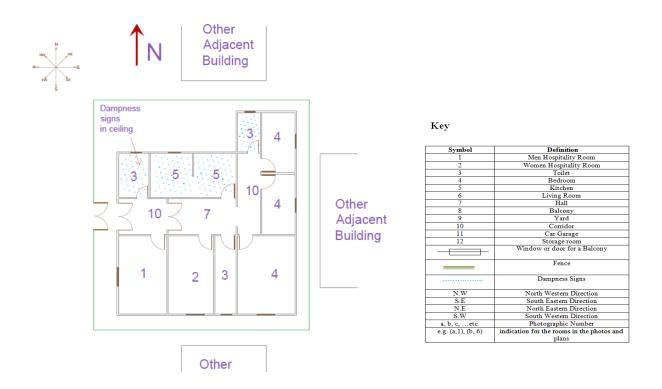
Condition survey: house 10, Al Gareda quarter, Albeida, Green Mountain, Libya, plan of one-storey house
